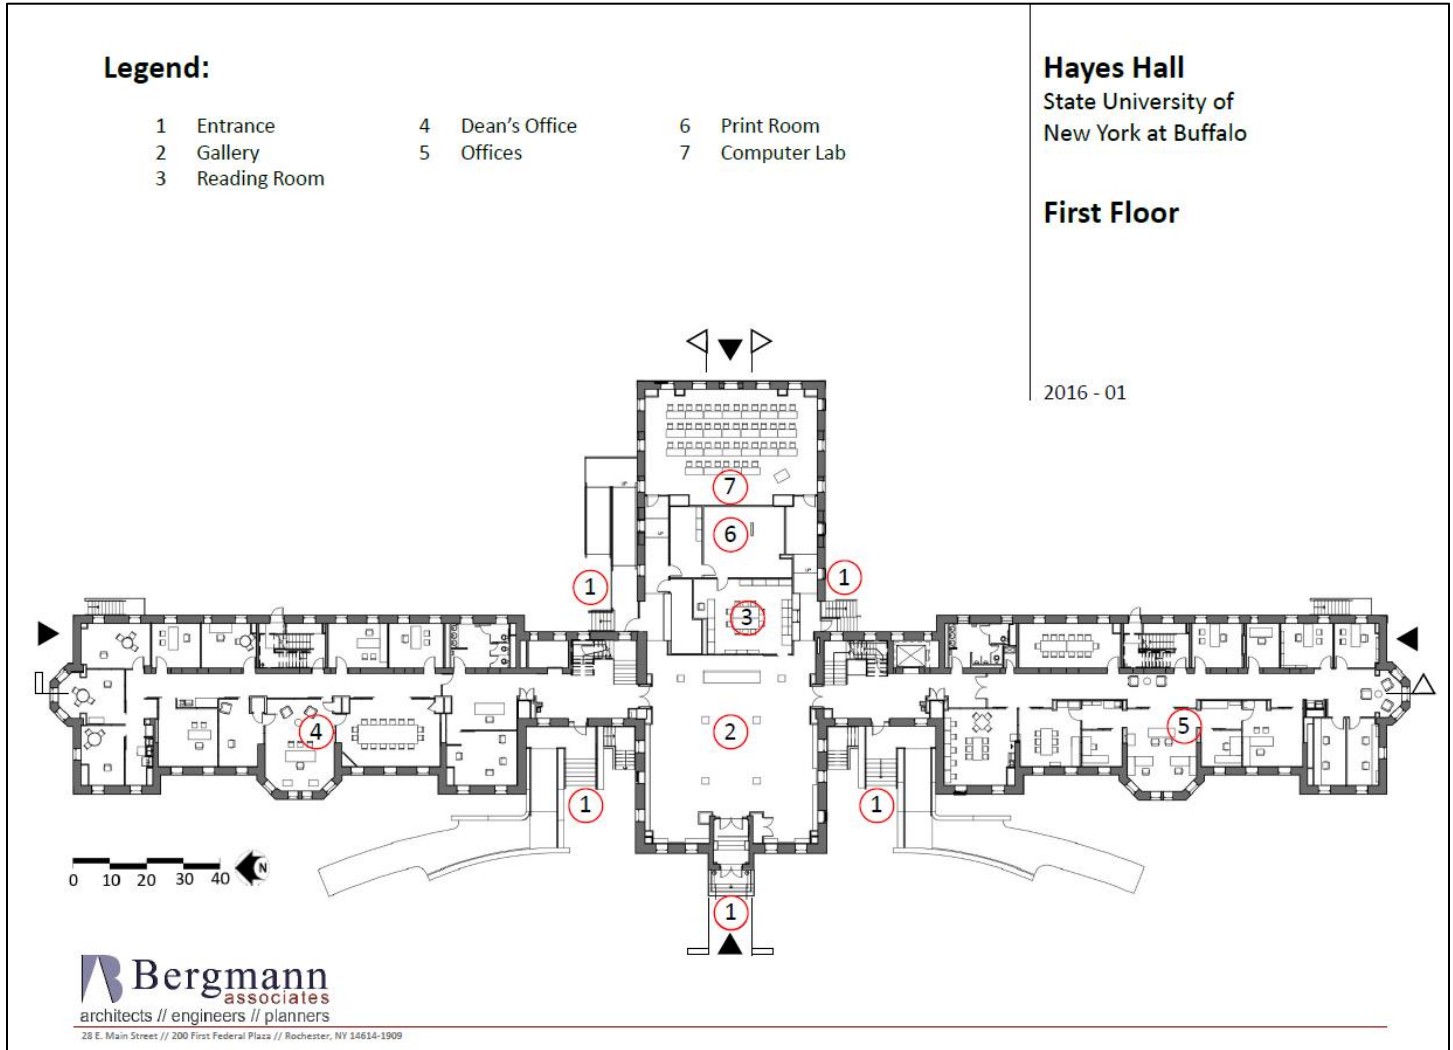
First floor plan of Hayes Hall showing current floor plan of building.
